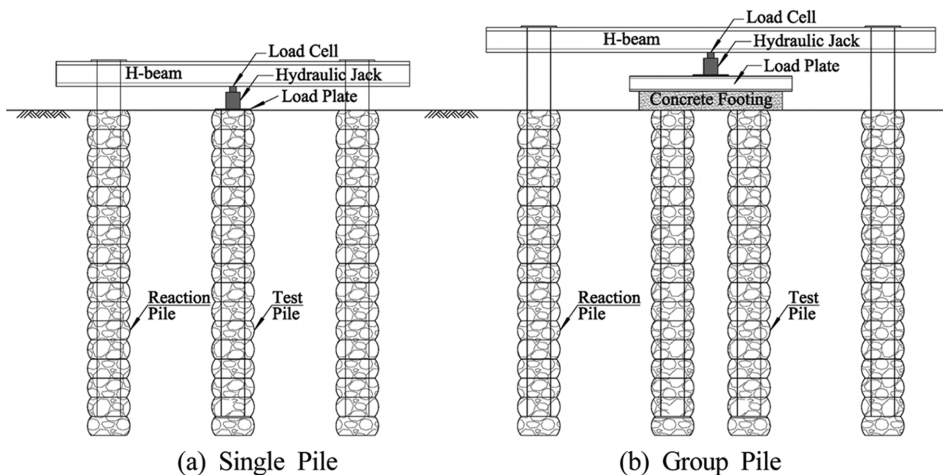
Sketch of static load test setup for GCP(Lillis et al., 2004; Bae and Lee, 2007).
